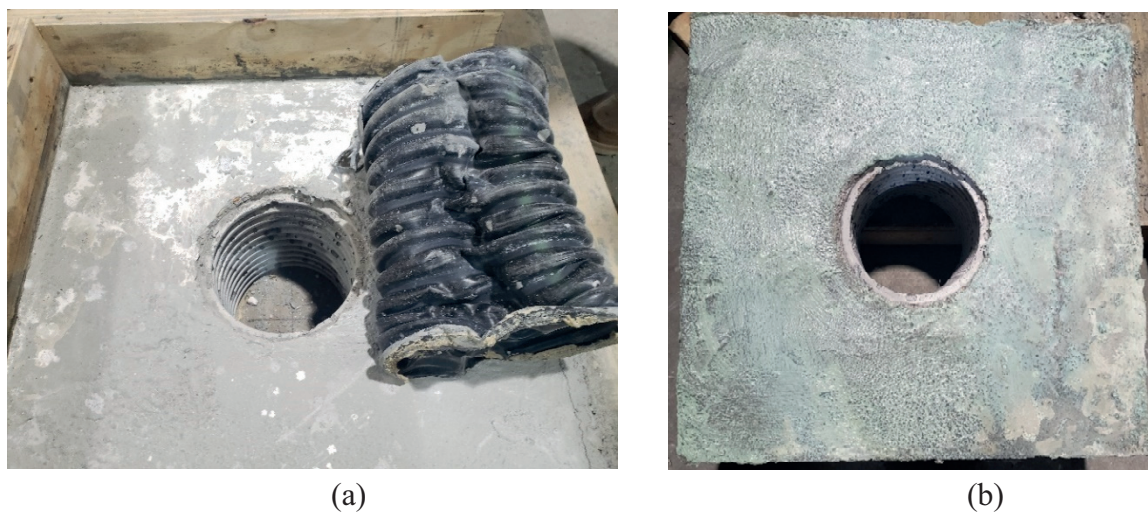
Concrete Section Preparation of Double Shear Test Specimen; (a) Removed Plastic Pipe, and (b) Applying Wax on Concrete Surfaces.
